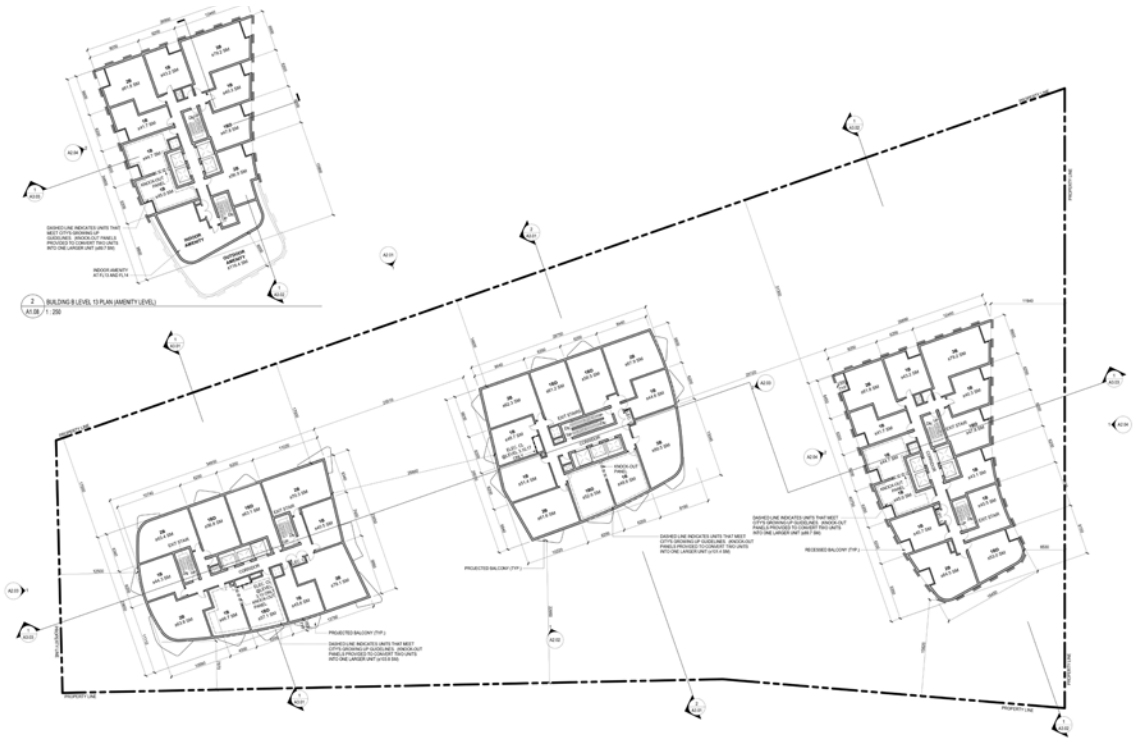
Typical Floor Plan (Prepared by Giannone Petricone Associates Architects)
